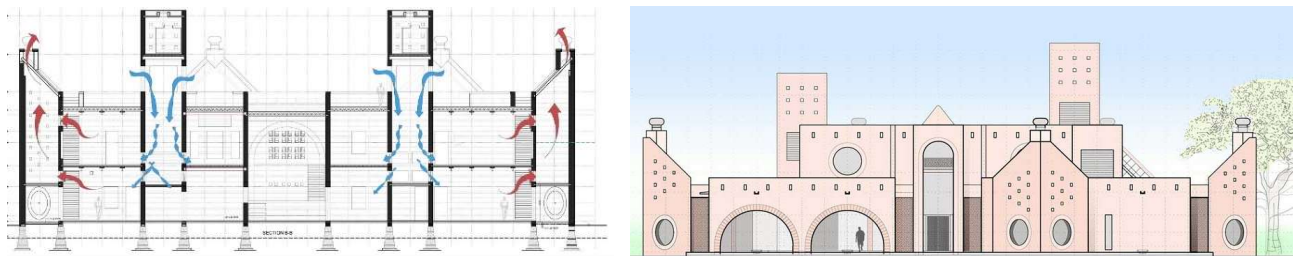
Natural ventilation through solar chimney and wind catcher & North side elevation (Source: taoarchitecture.com)
